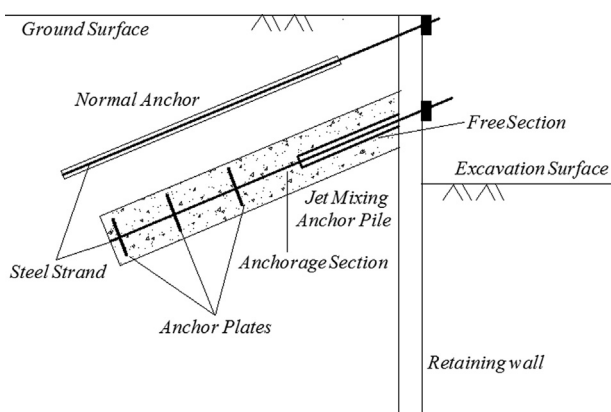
Difference between jet mixing anchor pile and normal anchor.
